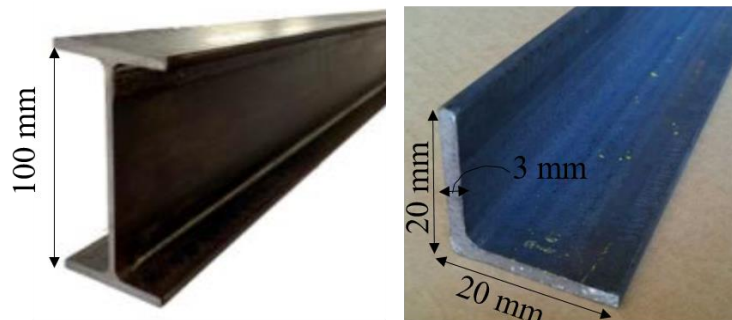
I-section steel beams (left) and angle steel (right) profiles
